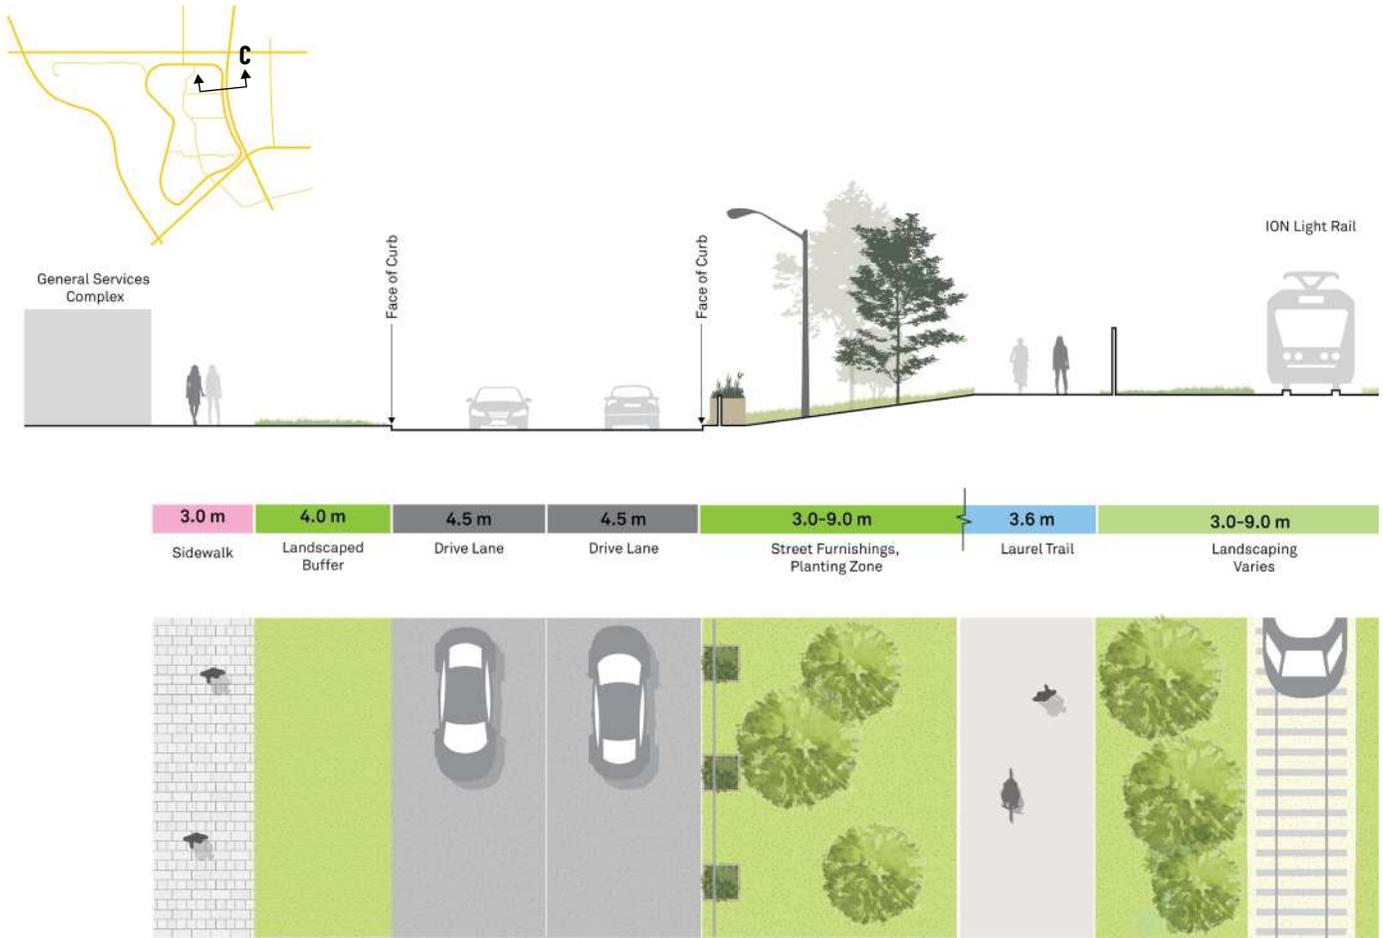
Section C. Existing condition of Ring Road (northeast edge from Hagey Blvd to William Tutte Way).
